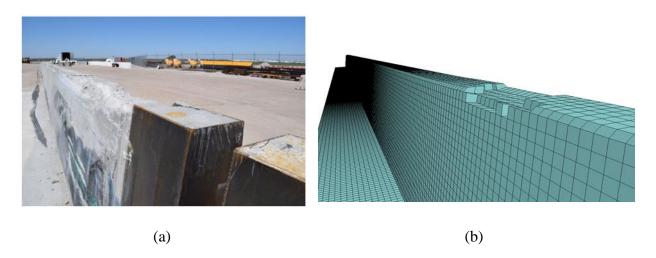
Manitoba Concrete Bridge Rail damage, (a) MAN-1 crash test, (b) impact simulation, adapted from [15]
